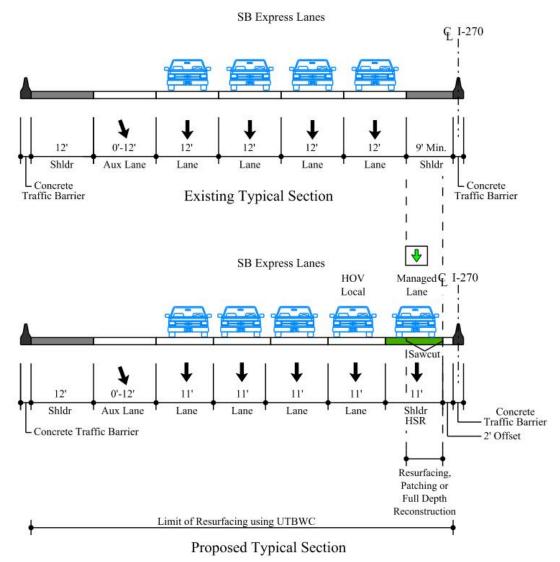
Existing and Proposed Typical Sections SB IS-270 between Watkins Mill Road and Muddy Branch Road
